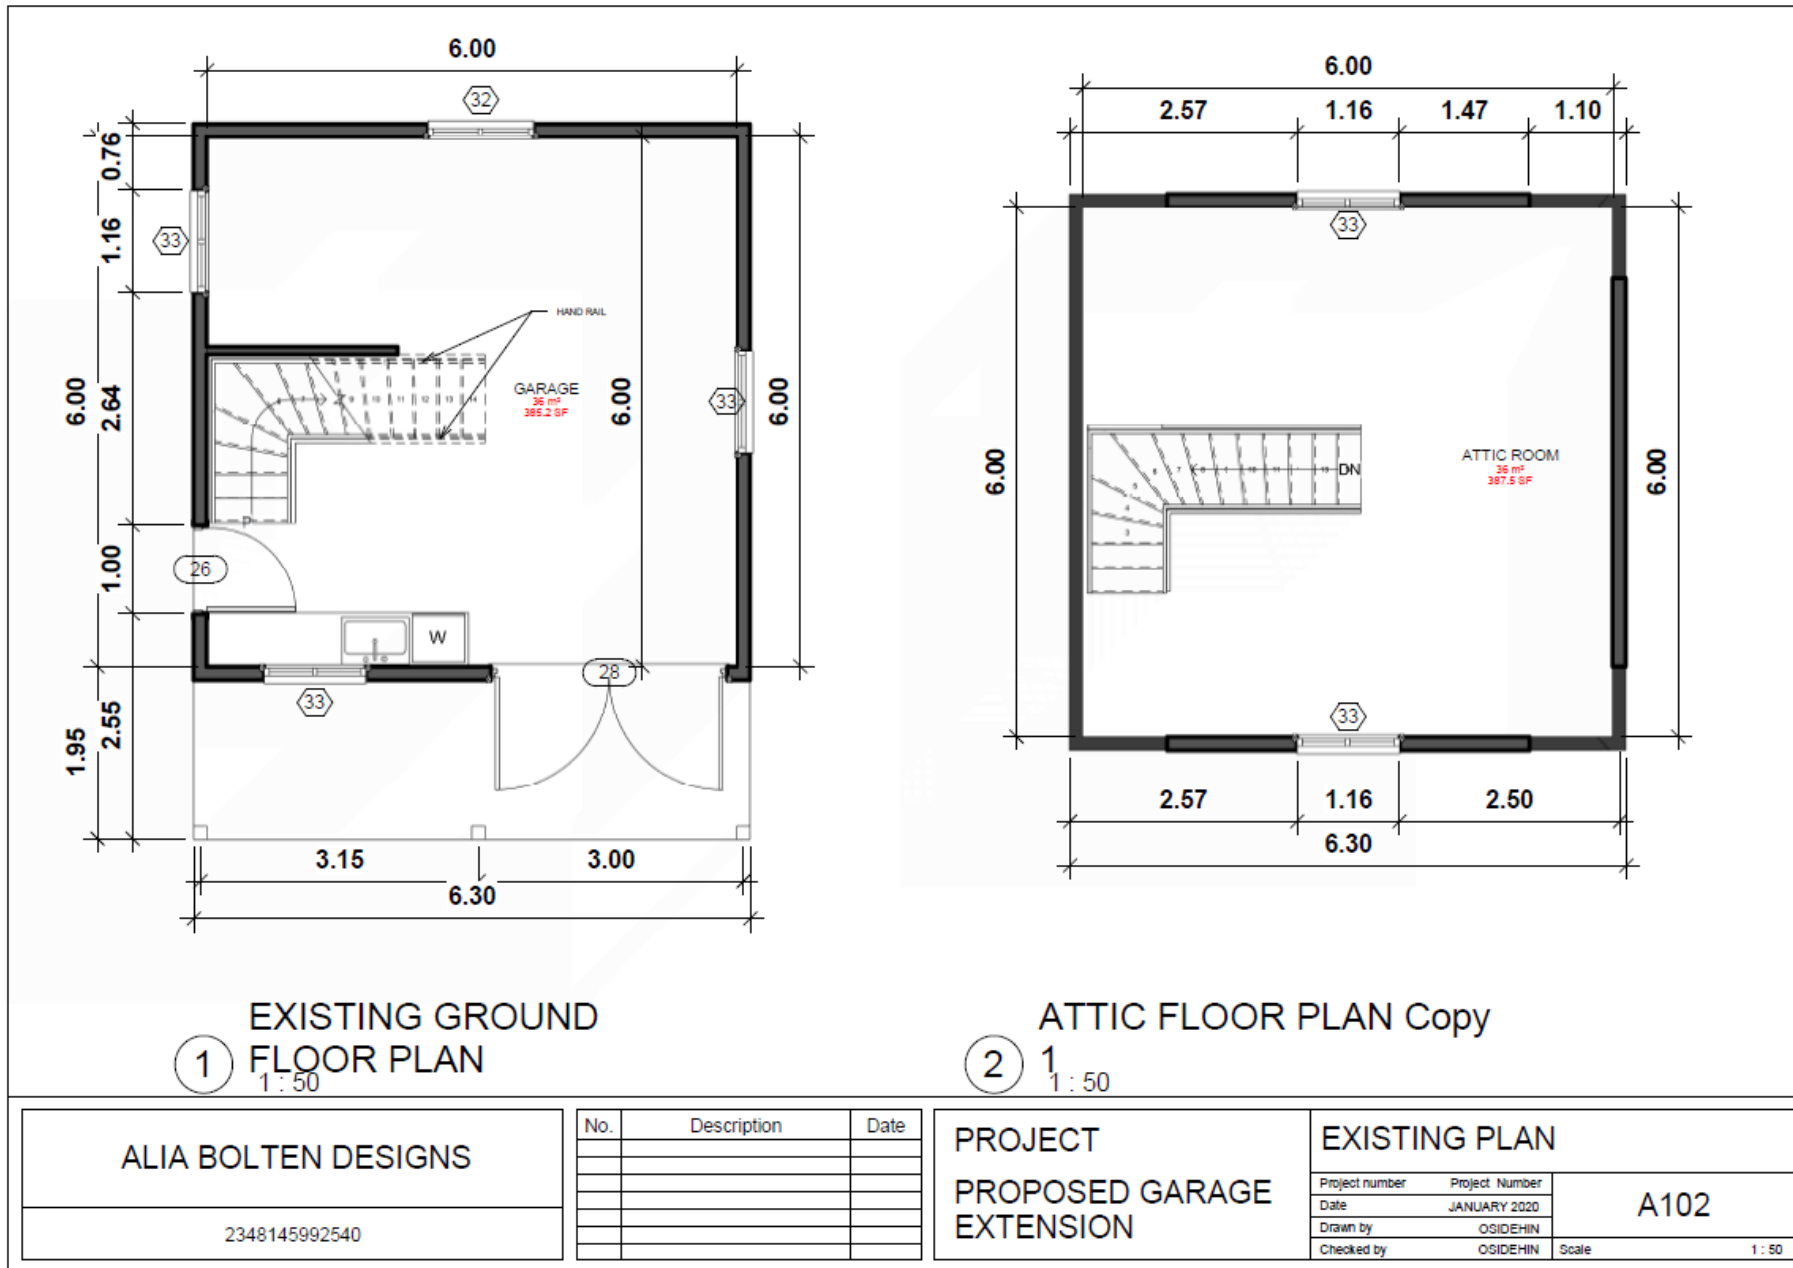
Applicant's submitted Existing Floor Plan for the detached garage
